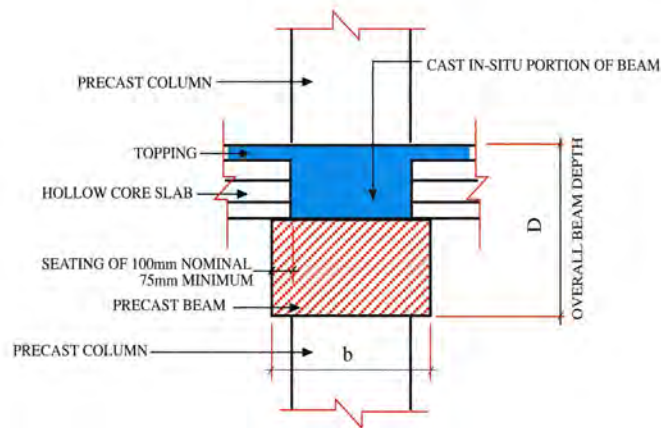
HOLLOW CORE SLAB ON PRECAST BEAM
